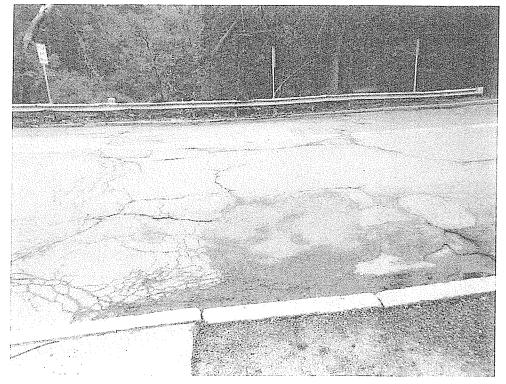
Typical wearing surface photo showing heavy cracking throughout.
